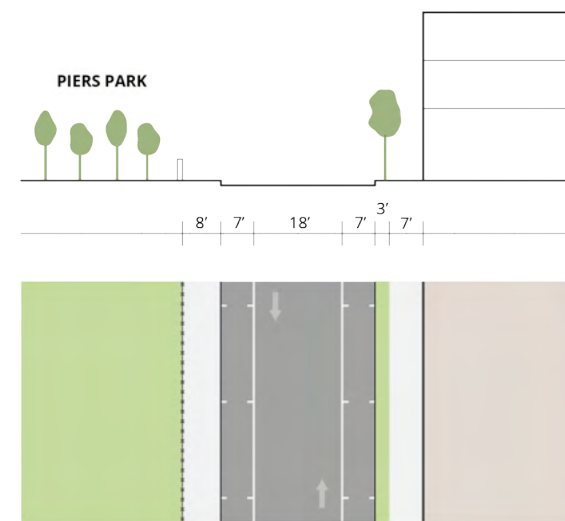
MARGINAL STREET SECTION - EXISTING CONDITION FOR PUBLIC WAY
